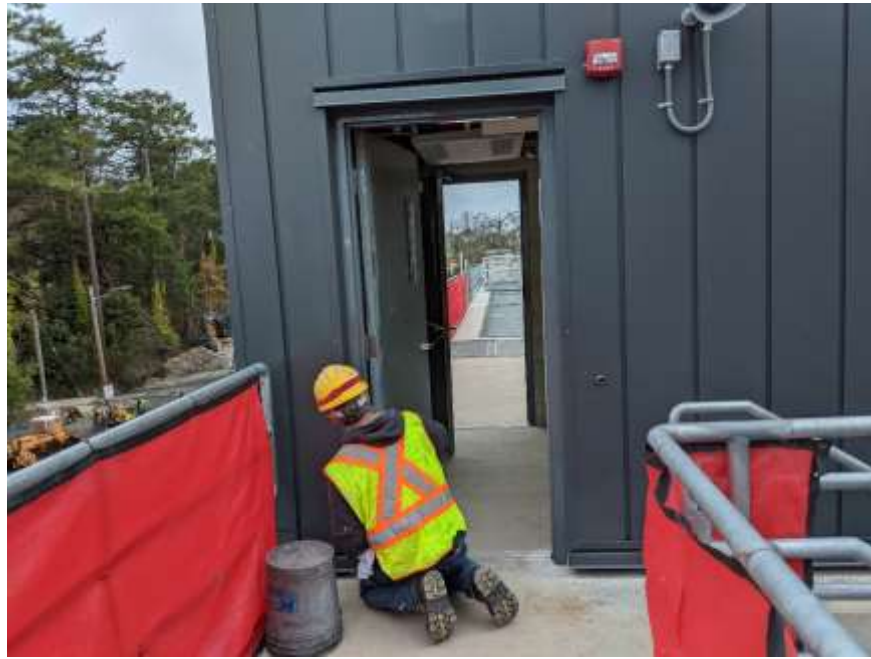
McLoughlin Point Wastewater Treatment Plant- Painting doors on West stairway penthouse.
